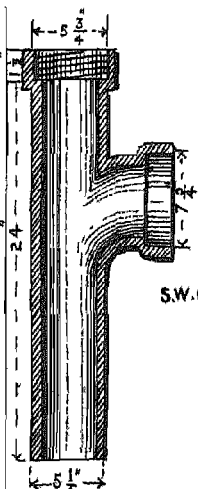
and 33 show respectively the class of stoneware and cast-iron pipes and fittings used in house-connection works in Bombay. It has been the practice to use 6-inch pipes for all branch drains, except those of very short lengths. This size is in many cases theoretically too large for the maximum amount of sewage which the pipes will ever be called upon to discharge, but is adopted for the reason that so much solid matter in the way of sand, ashes, and vegetable refuse is discharged into the branch drains that pipes of less diameter would constantly become choked.
